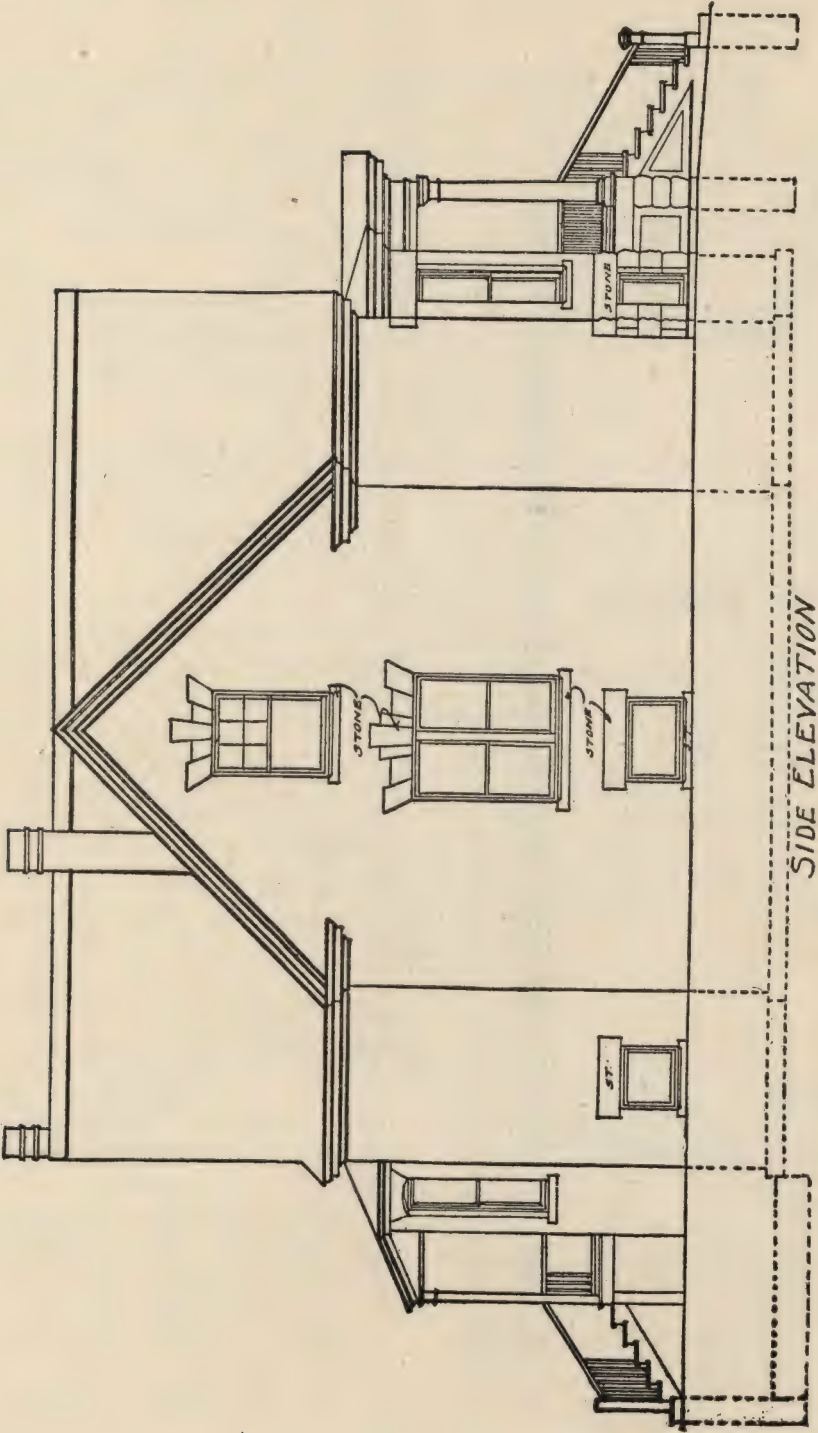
SIDE ELEVATION OF BRICK HOUSE SHOWN IN FIGS. 62 AND 63.
